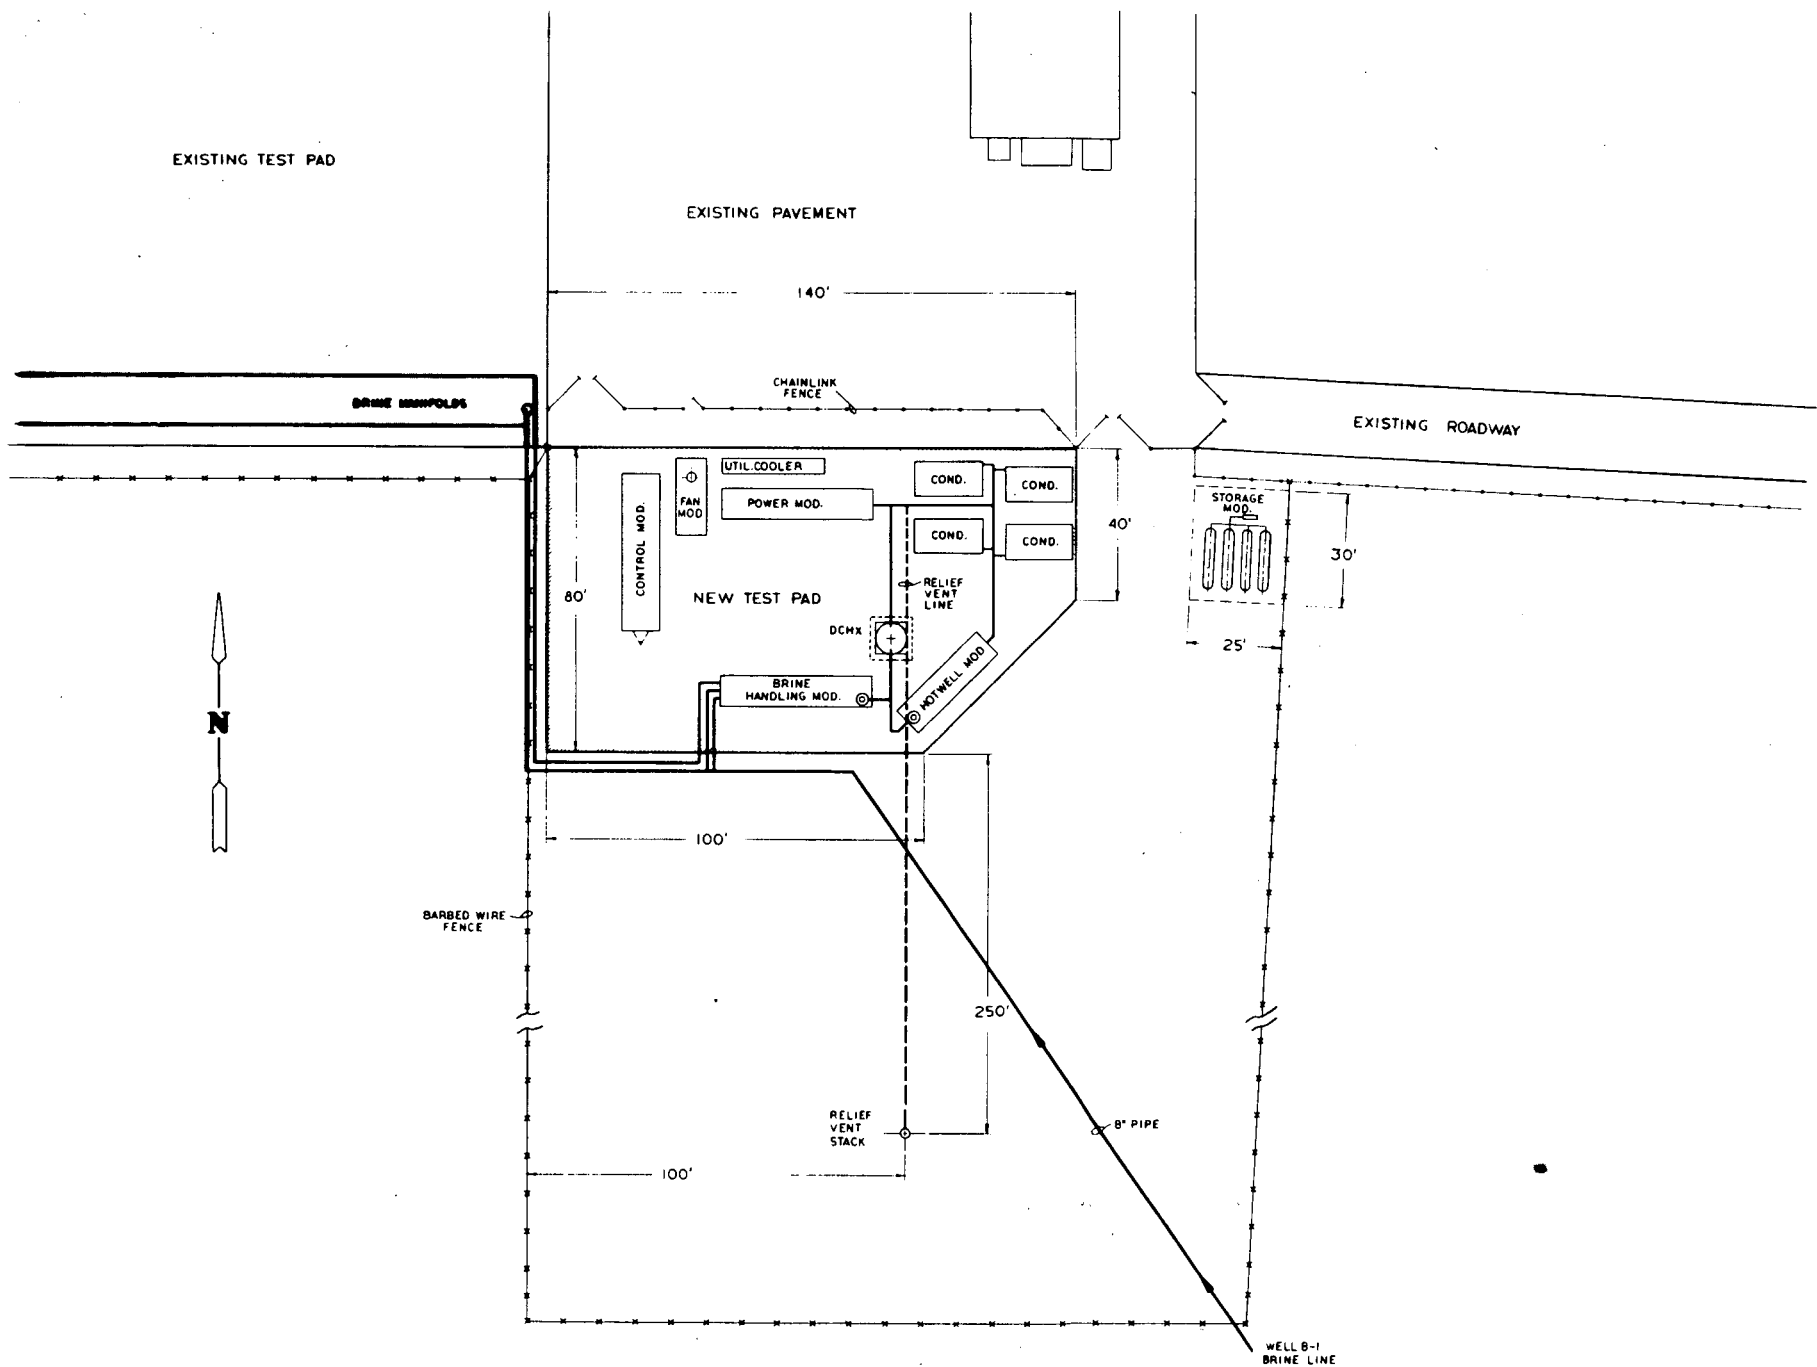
General site layout of 500 kW pilot test plant at DOE's East Mesa Geothermal Component Test Facility.
